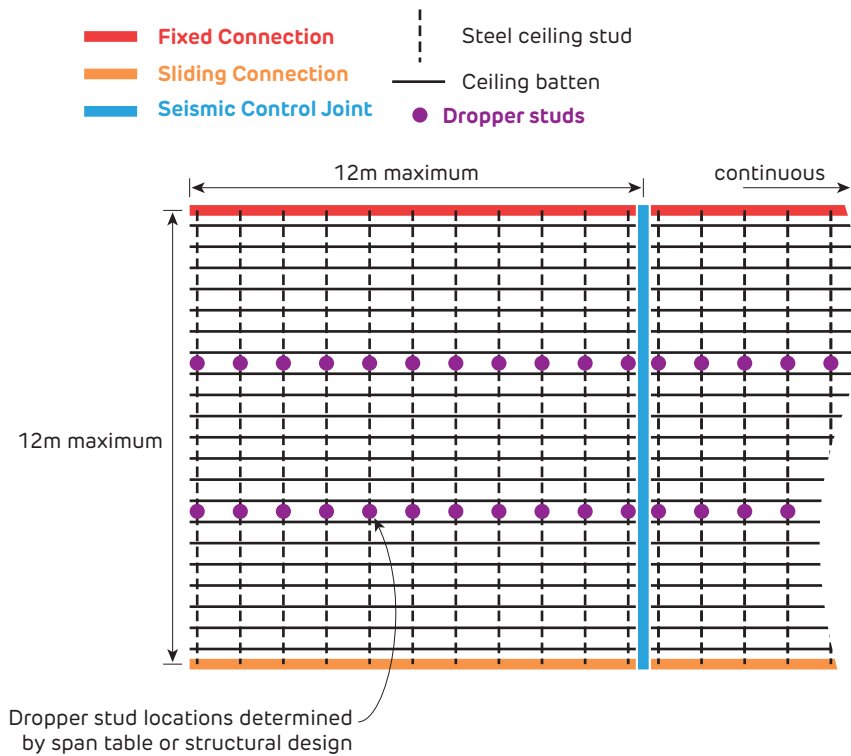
Stud Ceiling Type A3 - Fixed / Sliding
